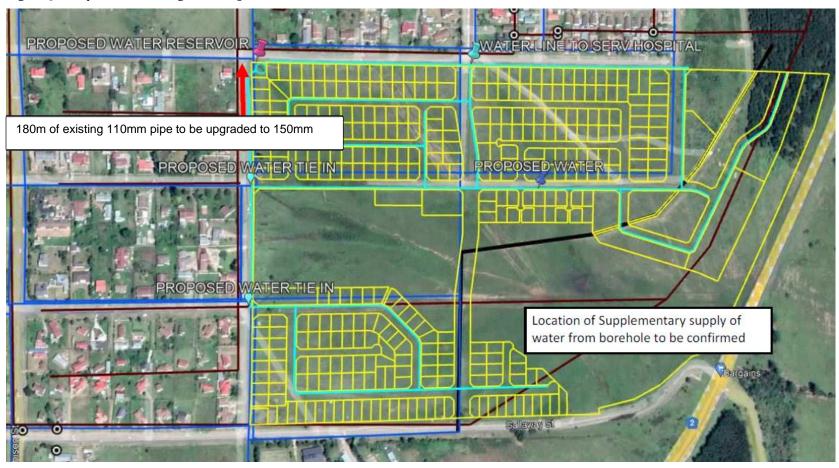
below illustrates the layout of the existing and proposed water reticulation.
